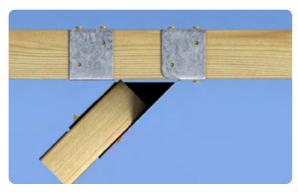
Joist hanger at 45°. (Image credit: MiTek)
